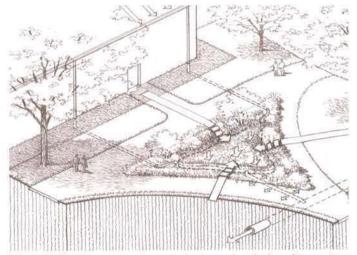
Illustration of a typical rain garden designed to capture runoff from adjacent buildings and paved areas.
